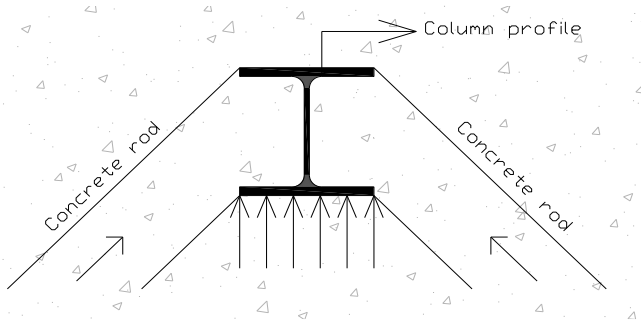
Plane view of the slab in the vicinity of the joint - development of concrete rods in compression under sagging moment [9]
